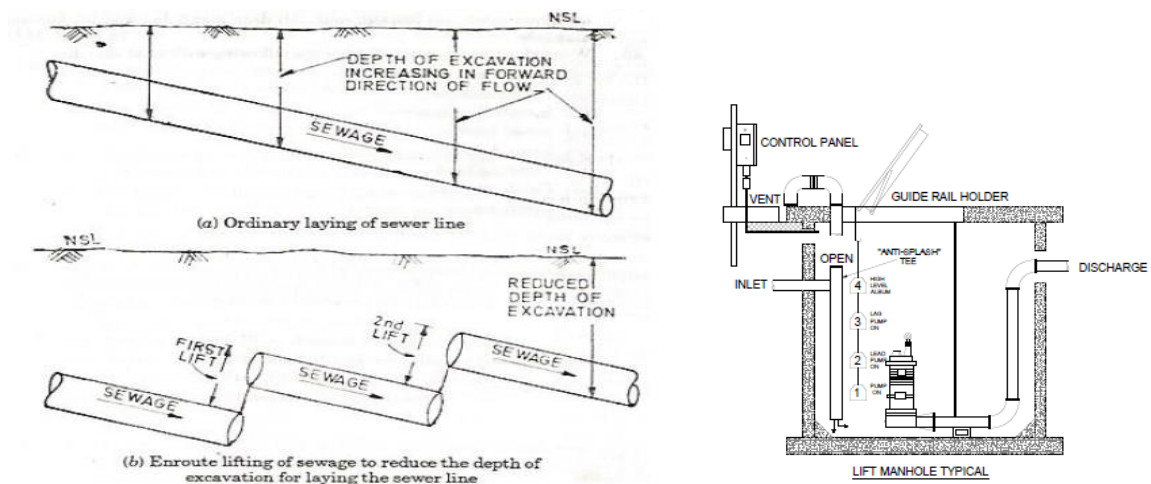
Enroute lifting of sewerage line and a typical lift manhole
